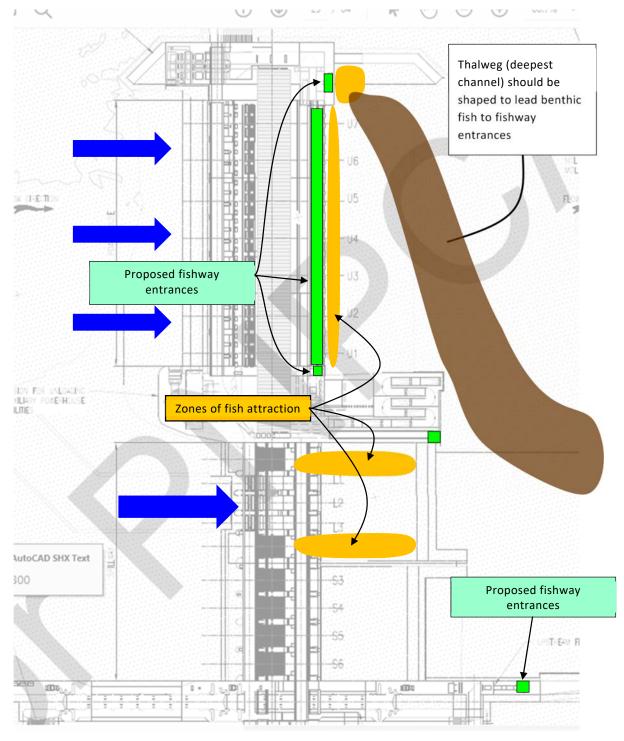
Plan view of powerhouse and spillway showing: fishway entrances (green) and zones of fish attraction (orange) at <u>low</u> spillway discharge with only low-level spillway outlets being used; and recommended shaping of thalweg (deepest channel).
